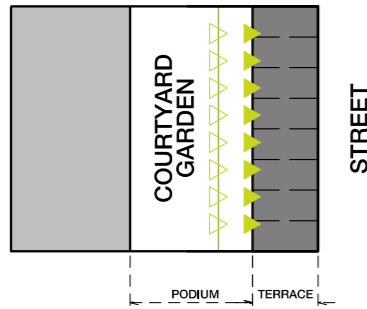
Plan diagram: First floor frontages behind Terraced Houses.
